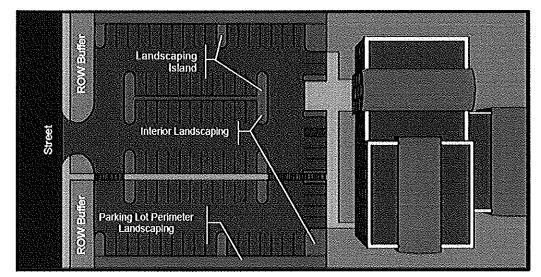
Island, Interior, and Perimeter Landscaping Plan View Illustration
